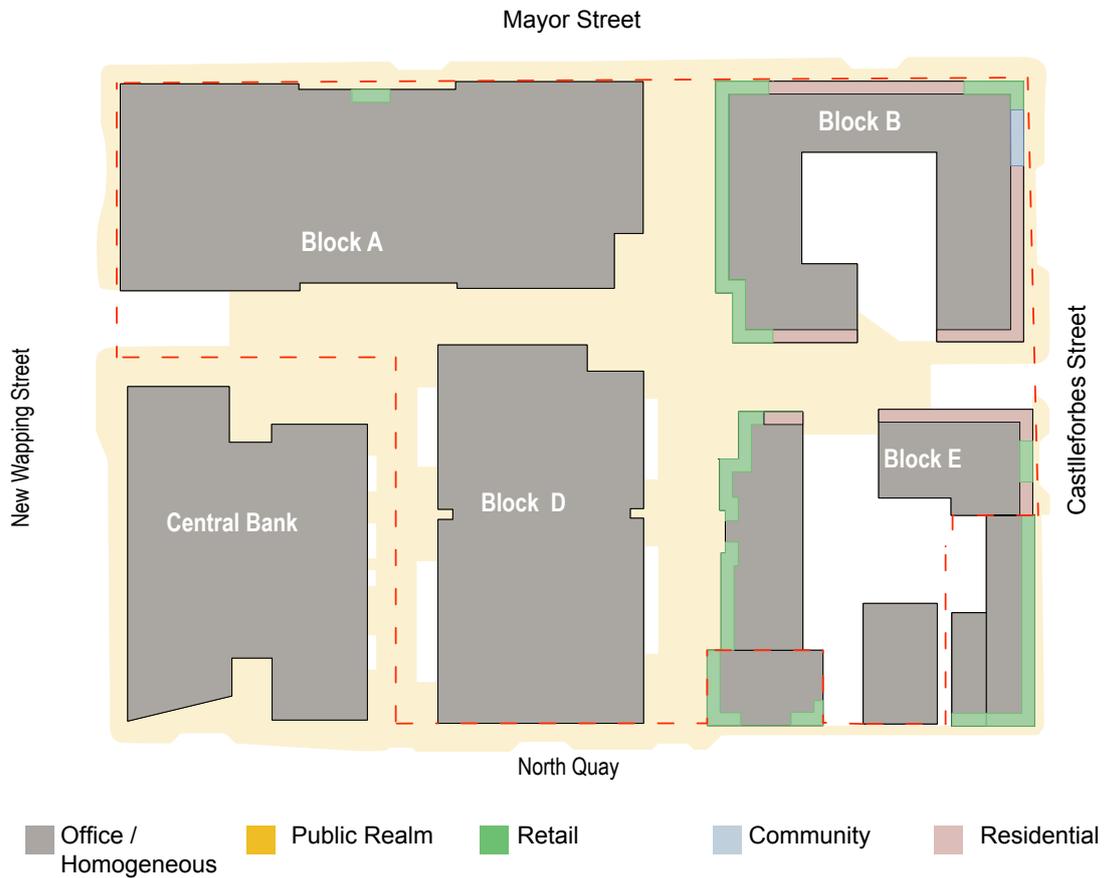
Plan Showing ground floor activation along public routes as constructed.
